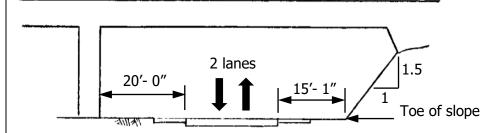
Bridge elevation view of horizontal clearances for a 2-lane highway with 2-way traffic below the bridge.
